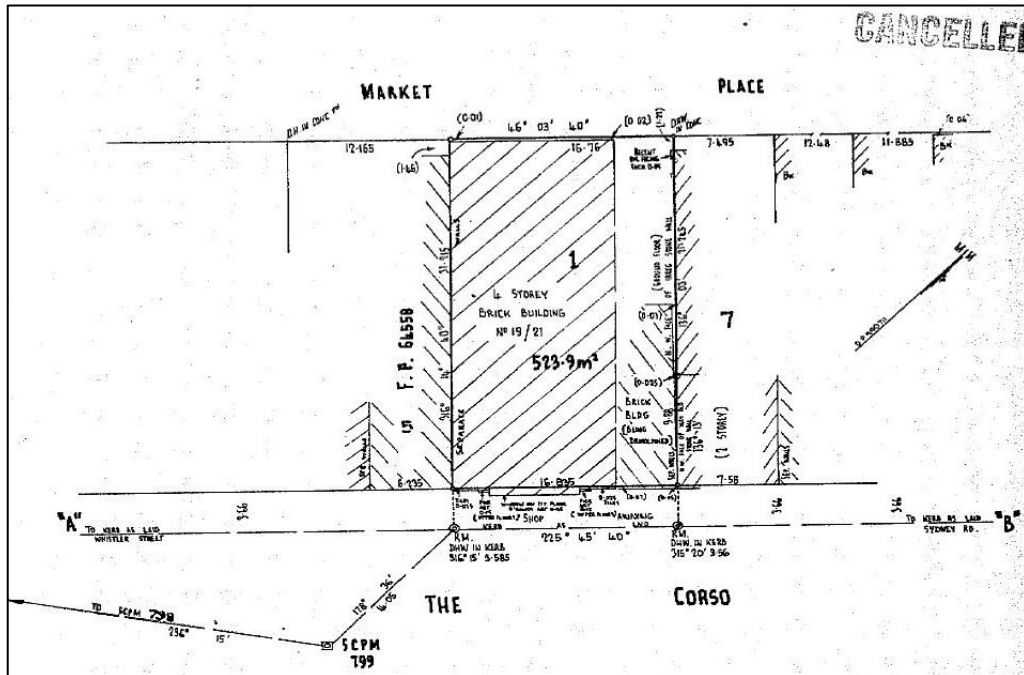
Plan issued with the new Certificate of Title for the consolidated site, showing the 4-storey brick building at 19-21 The Corso, and a “Brick Building (being demolished)” at 23 The Corso. (Source: NSW LRS, CT Vol 13463 Fol 68)
